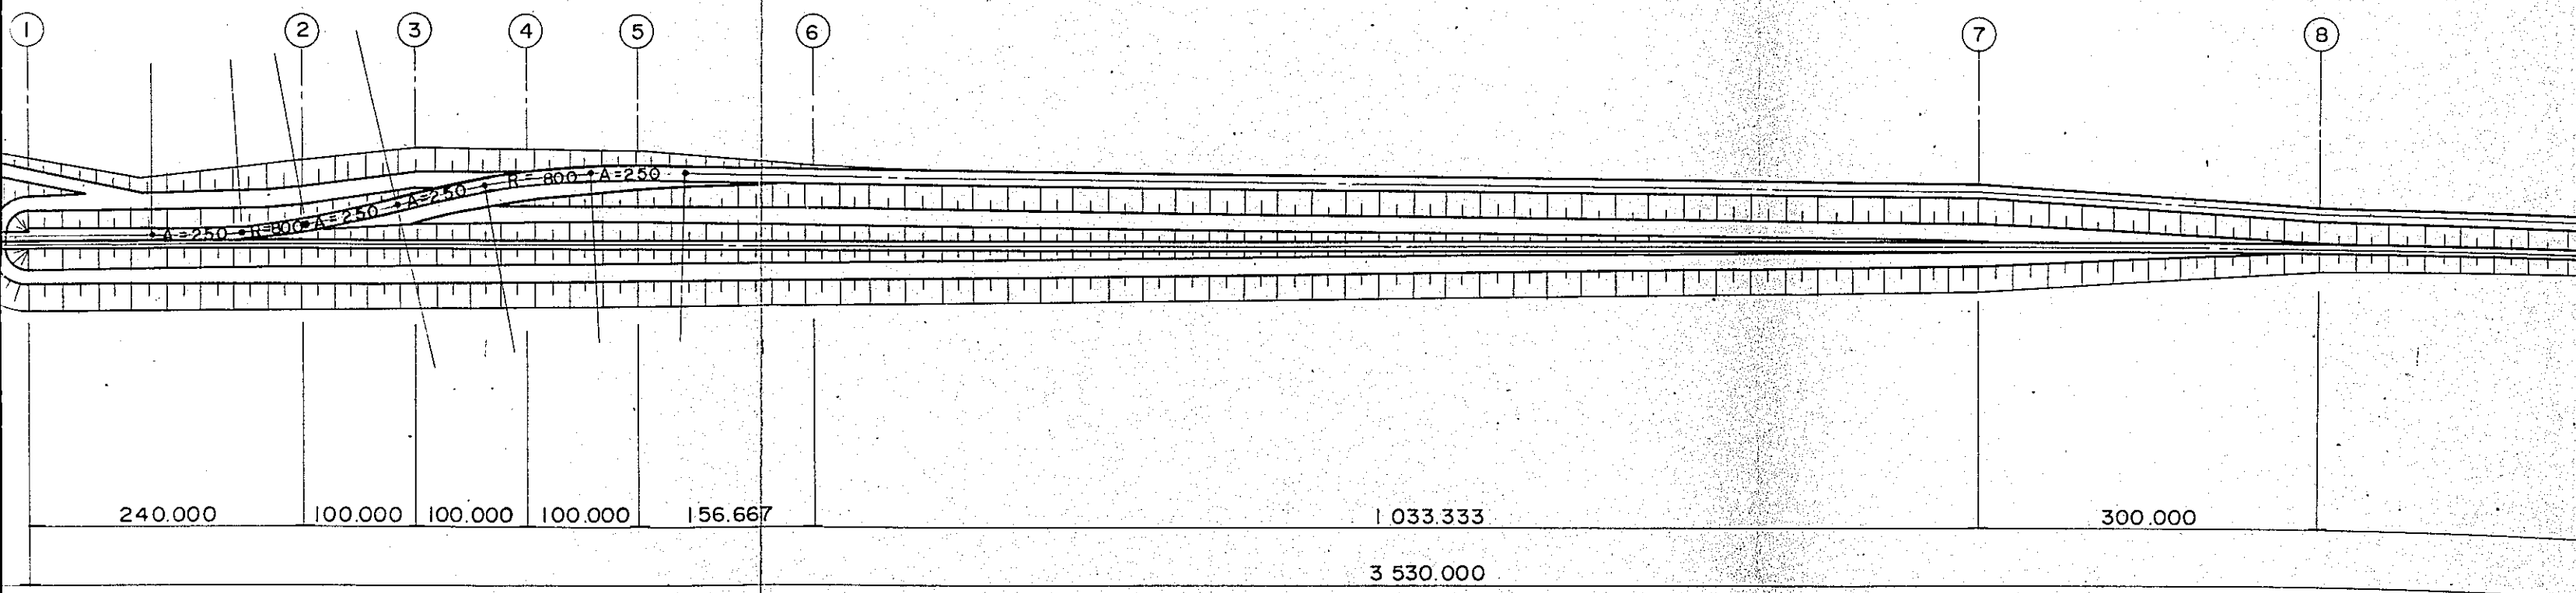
JAMUNA RIVER BRIDGE APPROACH (SINGLE TRACK RAILWAY & TWO LANE ROAD)
